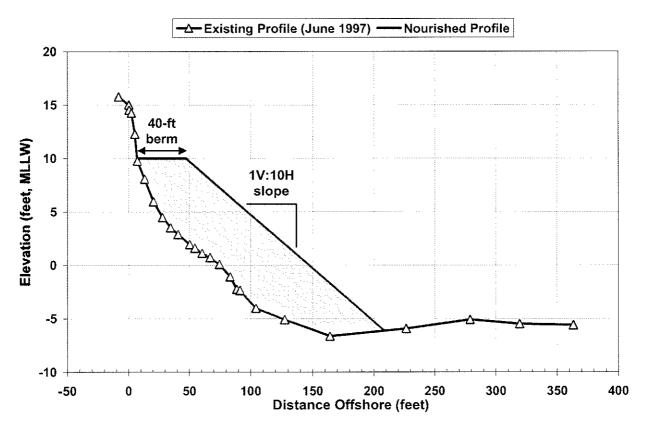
Alt. 1A and 1B - Cross-section of beach replenishment at the WWRF site.
